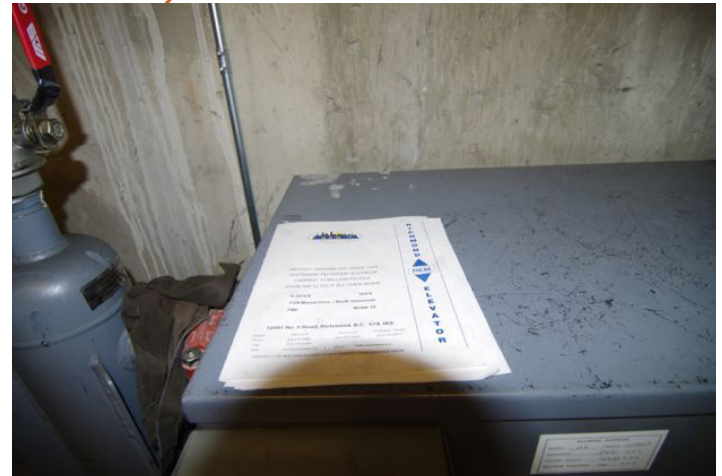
Photo shows the hydraulic pump for an elevator.
